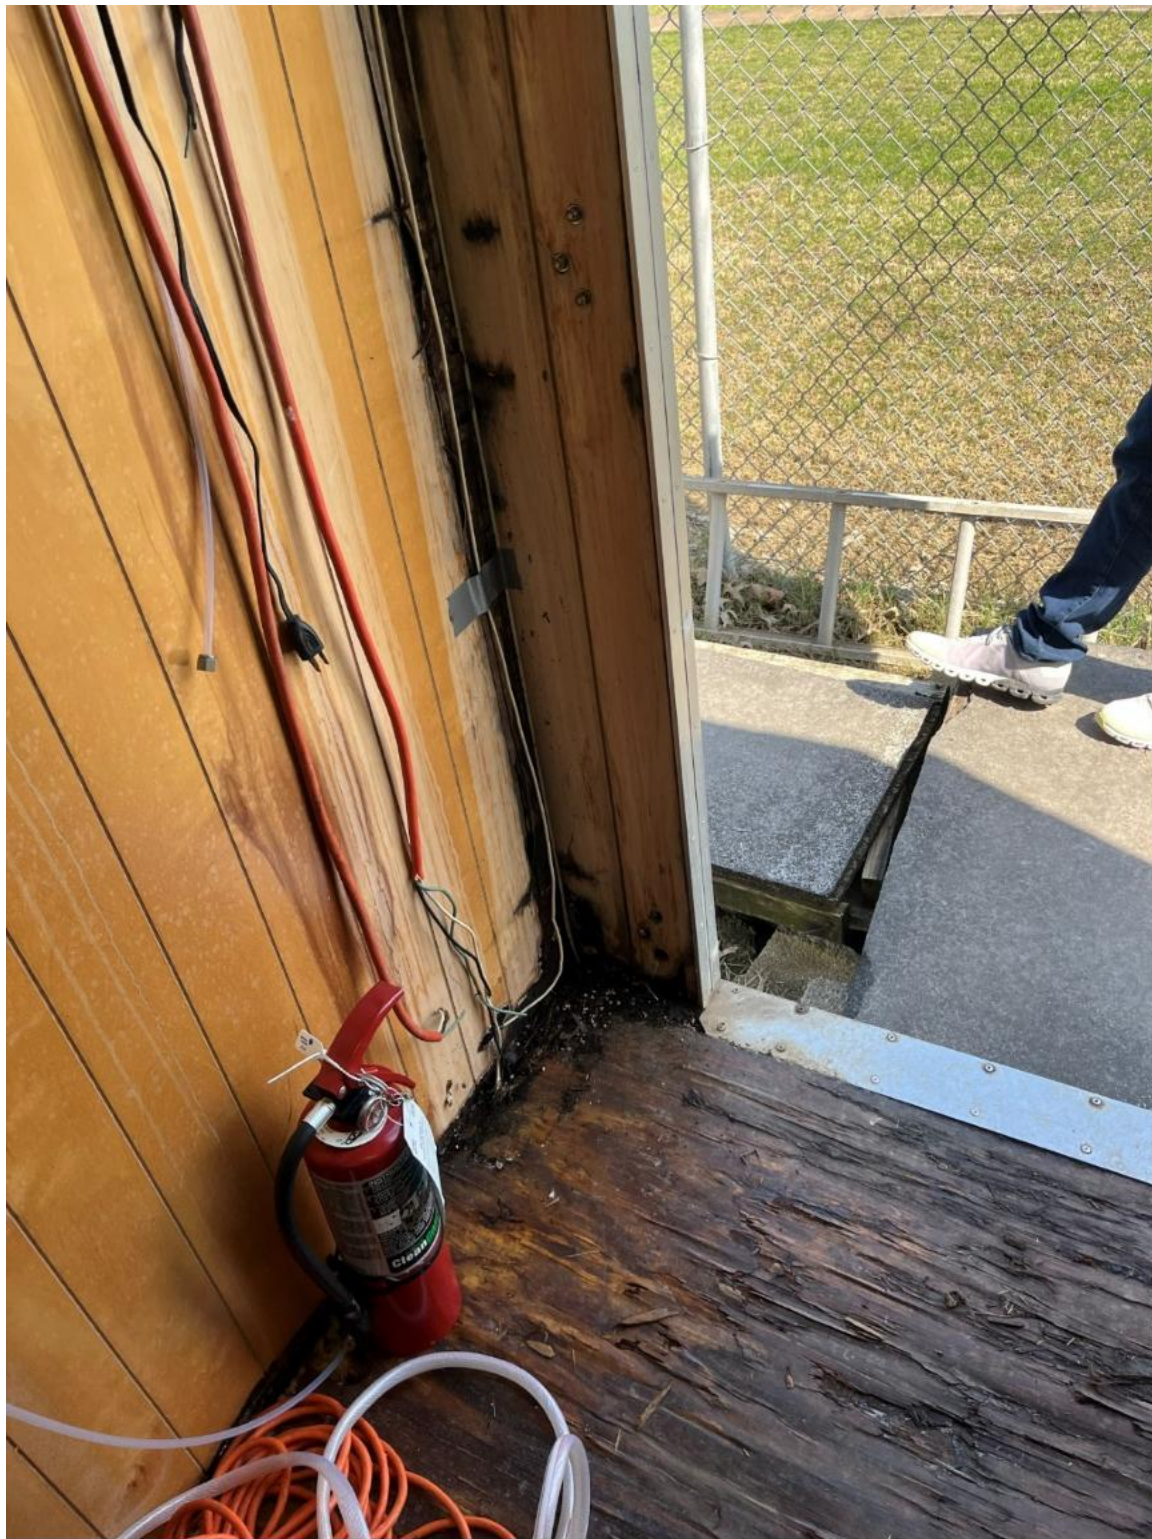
Current Marion Site, Interior; Floor, wall, roof damage from flooding conditions
